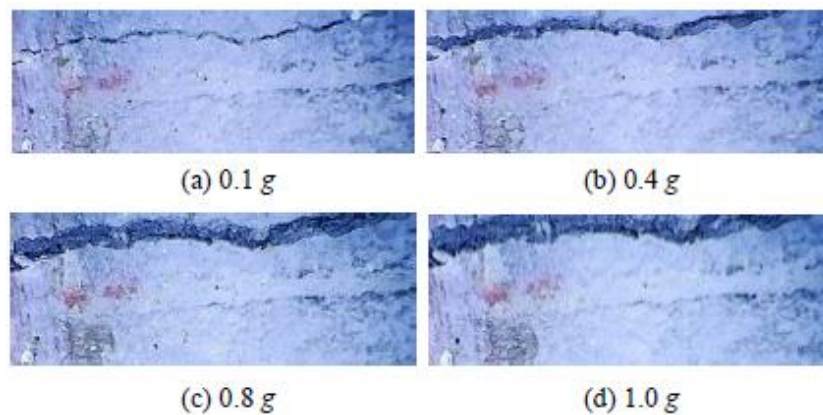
Evolution of damage on the invert of fiber reinforced concrete tunnel lining (Meng et al., 2016).
